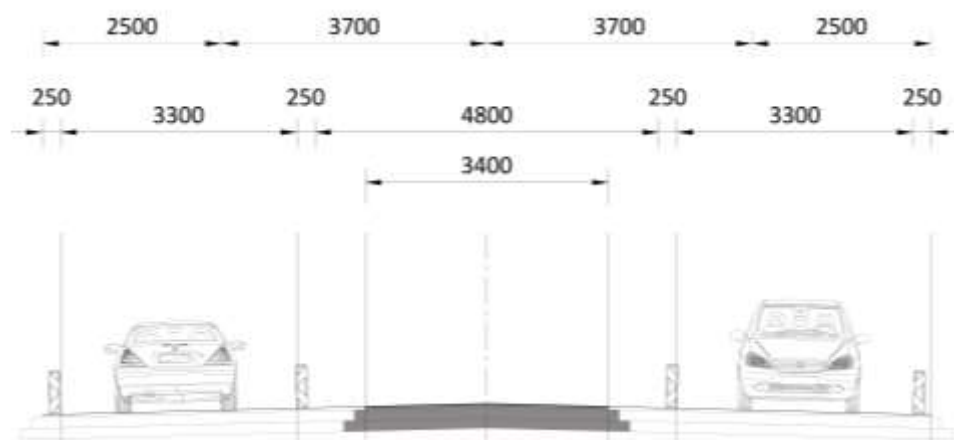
Typical arrangement for partial width construction (two-way traffic)
